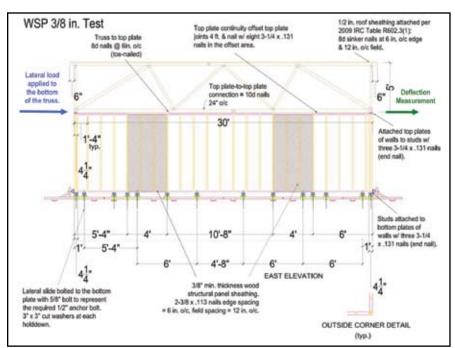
Side construction detail of SBCRI *IRC* conforming 12'x30' test structure, showing locations of applied lateral load, deflection measurements and how the entire structure sits on load cells to accurately measure load path
